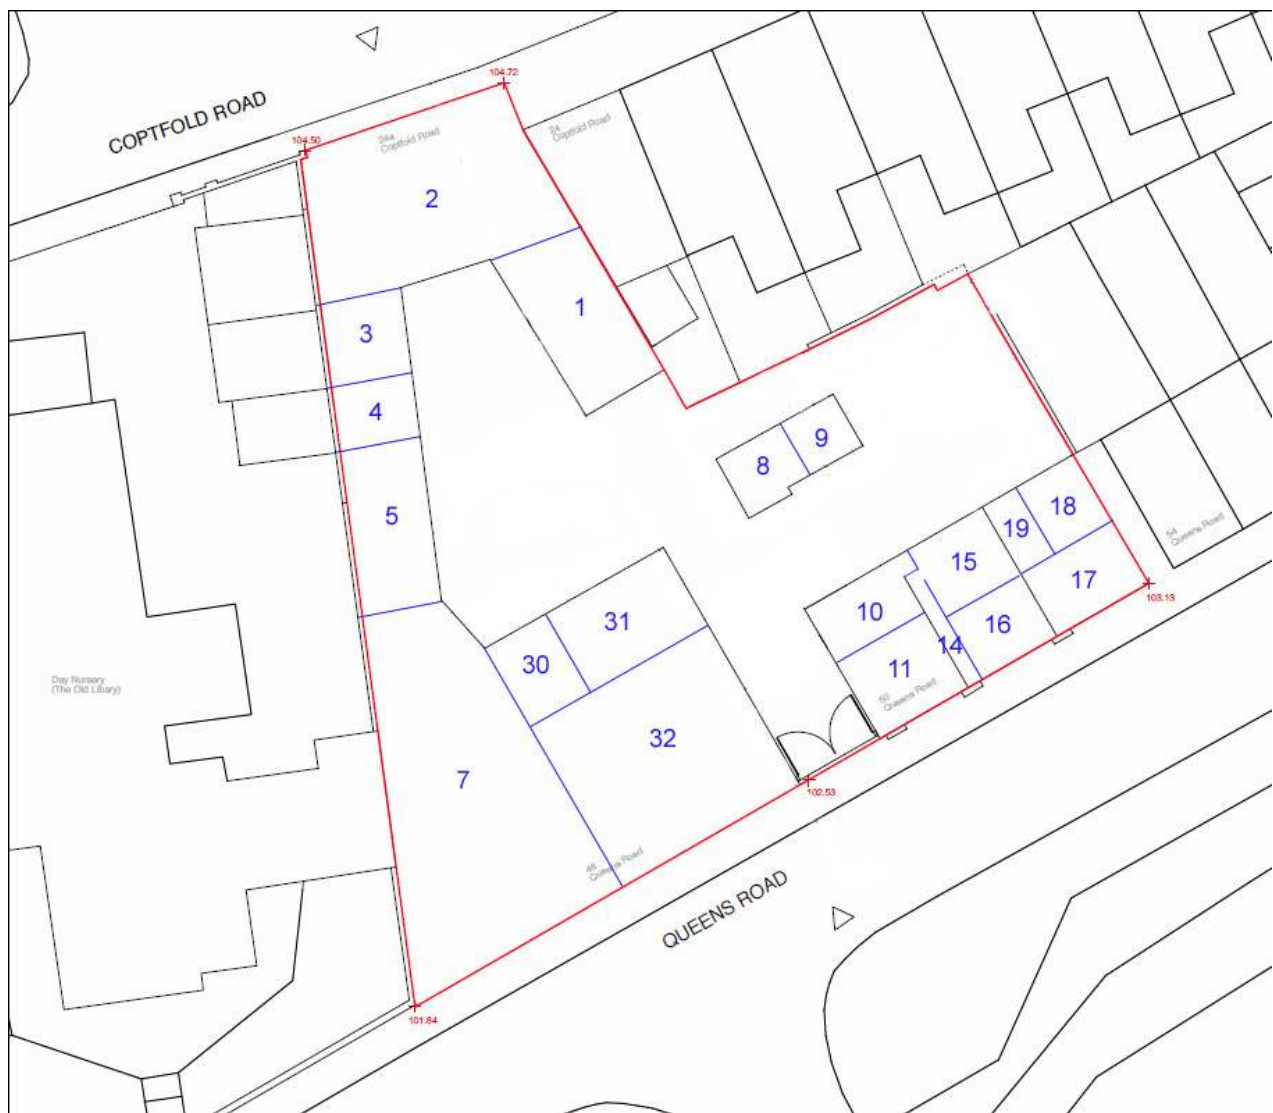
Ground-floor plan of the site, with numbered rooms.
